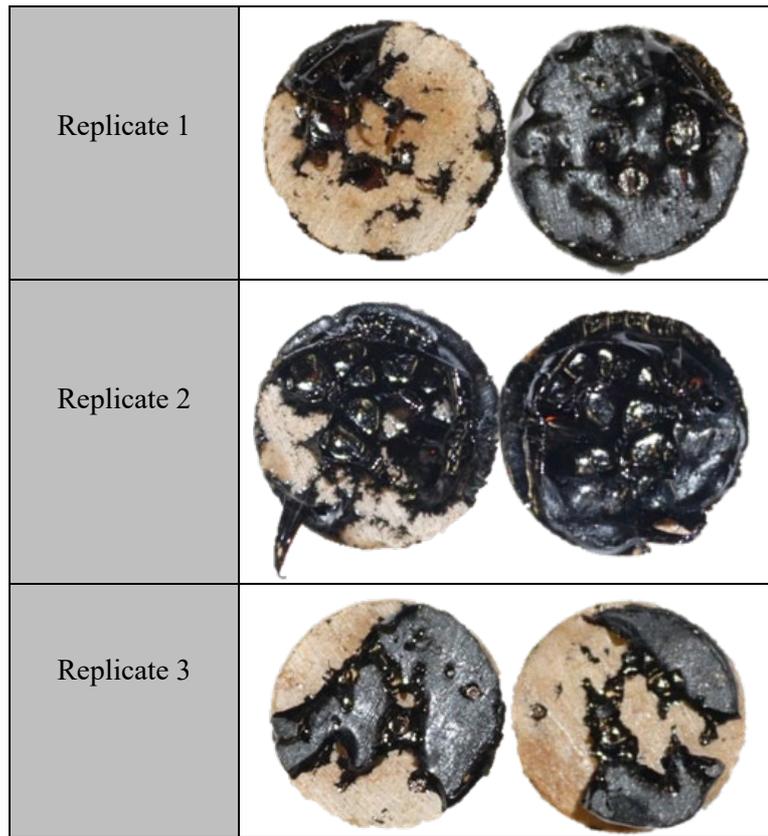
Failure Surfaces of Samples Fabricated with PG70 Binder and Tested at 5 mm/min after Moisture Conditioning
